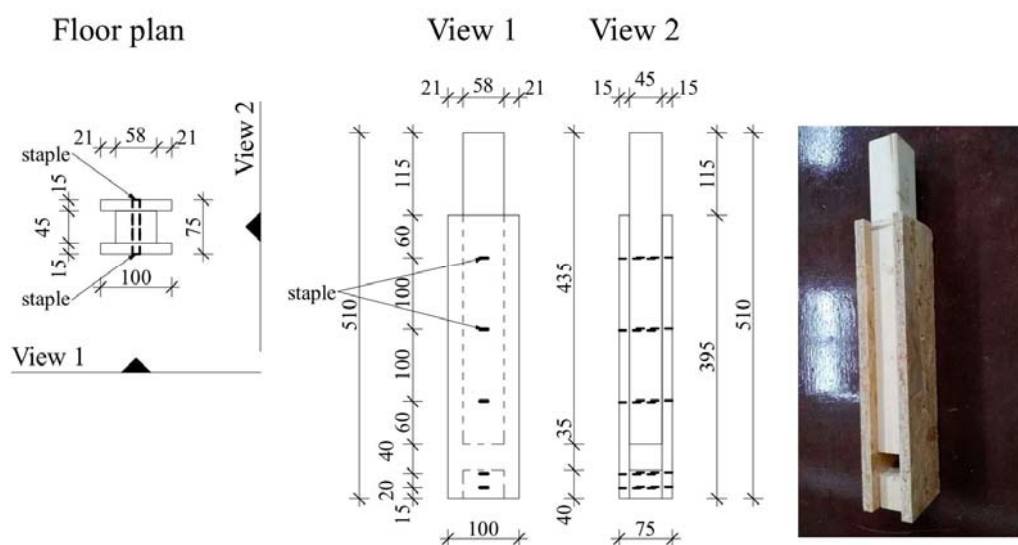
Dimensions and arrangement of the test specimen for performing staple joints in shear.
